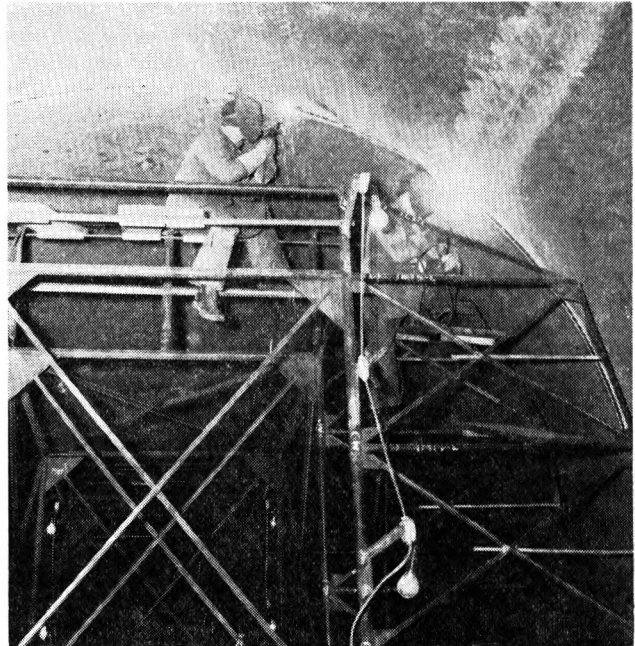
WELDING OF ERECTION JOINTS FOR 18-FT-DIAM PENSTOCKS IN TUNNEL
